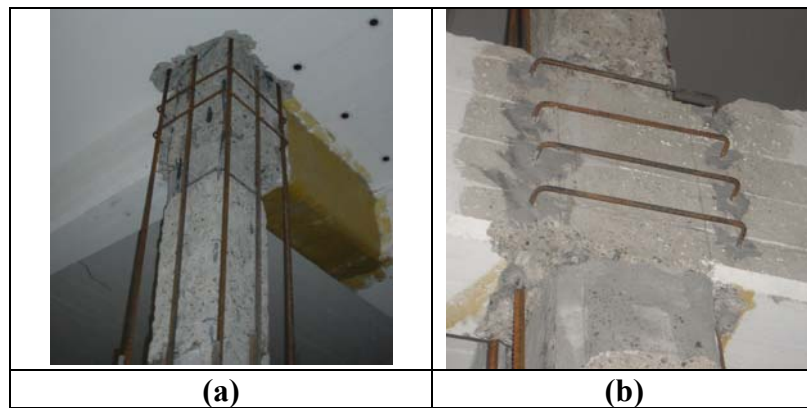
Added stirrups in correspondence of joints of column C4 and C1.
